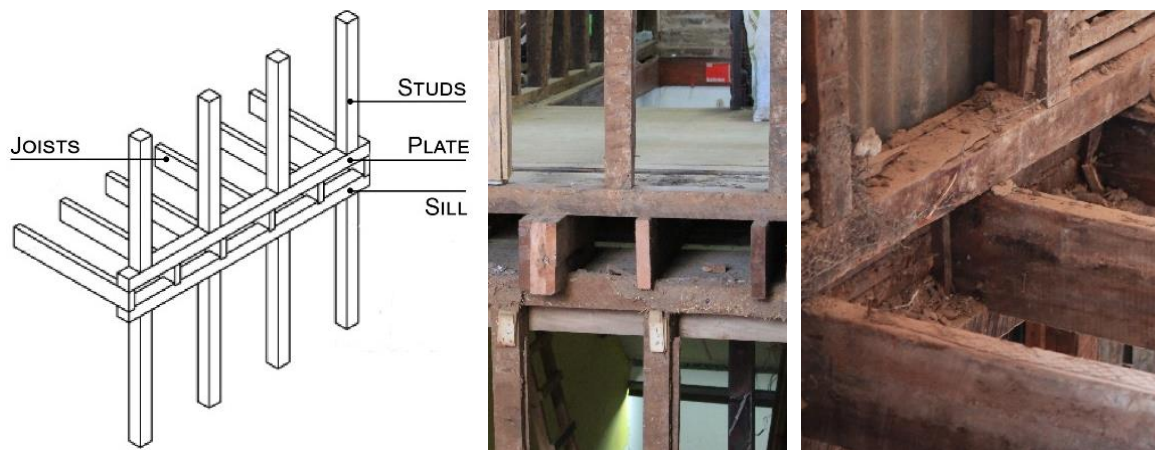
(a-b) Platform frame system configuration. (c) Walls-story connection. (Jiménez, 2015)
